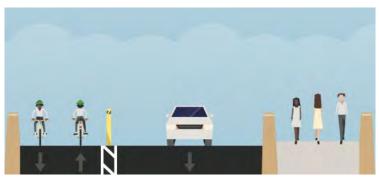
Proposed conditions on the St. Peter Street bridge over I-94 (looking north).
